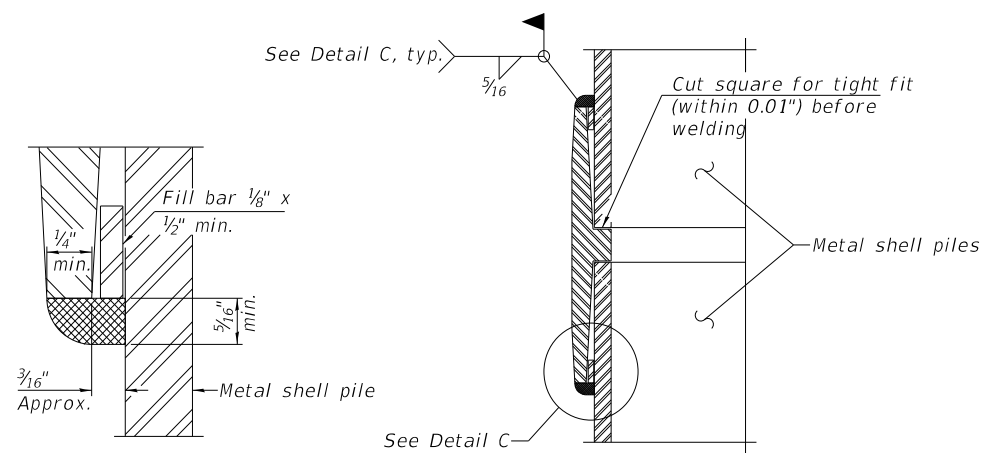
DETAIL OF CYLINDRICAL STEEL SHELL FOR CAST IN PLACE CONCRETE PILES
